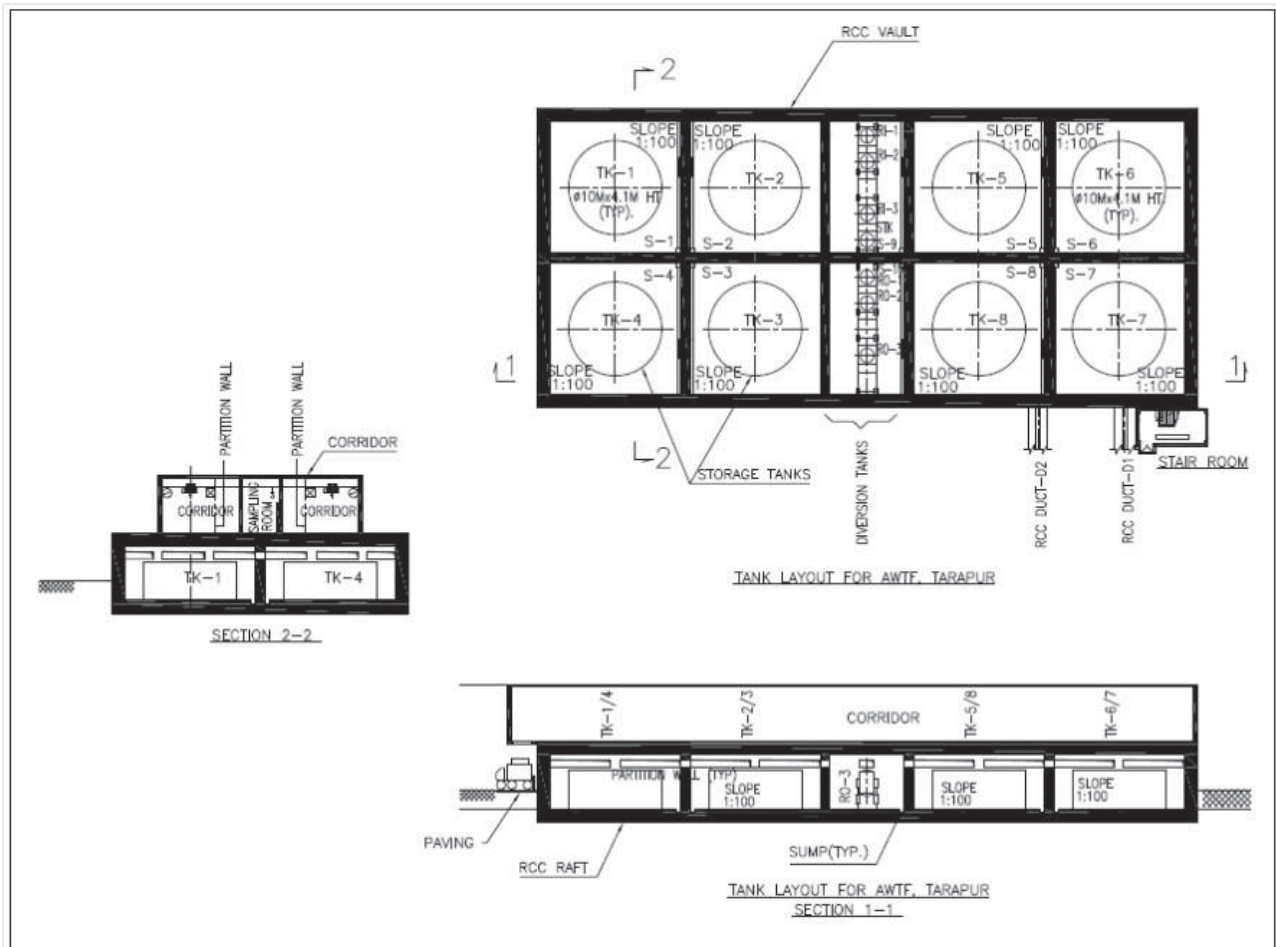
Plan, Elevation and Side view of AWTF vaults
